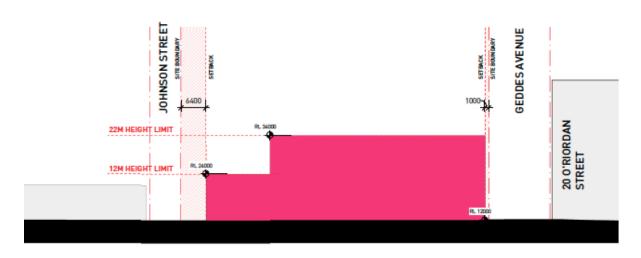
Proposed building envelope - Geddes Avenue extension (north) elevation
